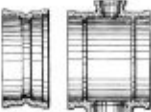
CONNECTING WOOD AND IRON PIPE.
